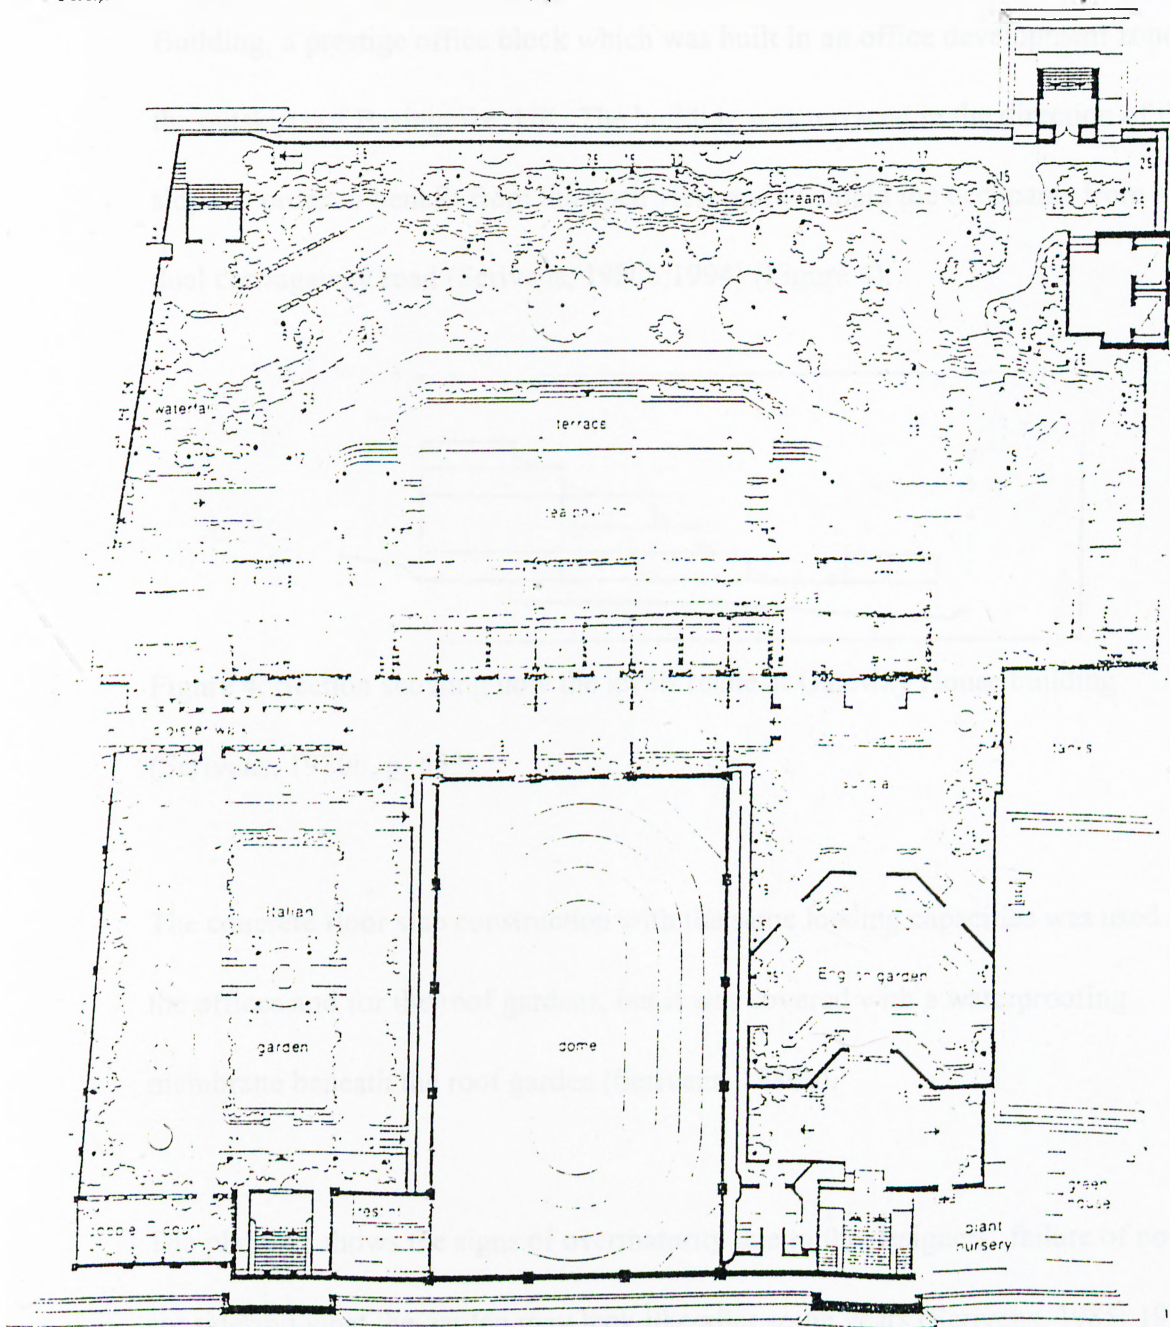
Original plan of the roof garden on Derry and Toms department store when it was constructed in 1938 (Scrivens, 1980g).
